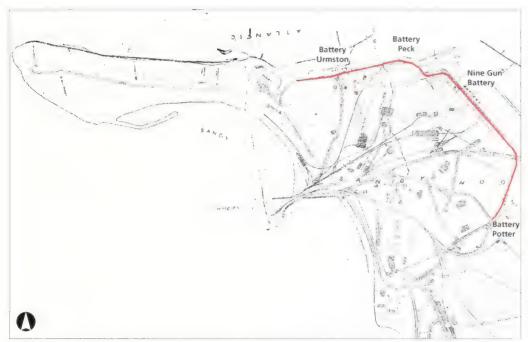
Blue print map showing construction of gravel roads at Ft. Hancock, N.J., August 31, 1907. The Army constructed a gravel road, highlighted in red, paralleling the rear facades of the Nine Gun Battery, Battery Peck, and Battery Urmston in order to provide access for personnel and delivery of munitions (GATE GIS and Olmsted Center).
